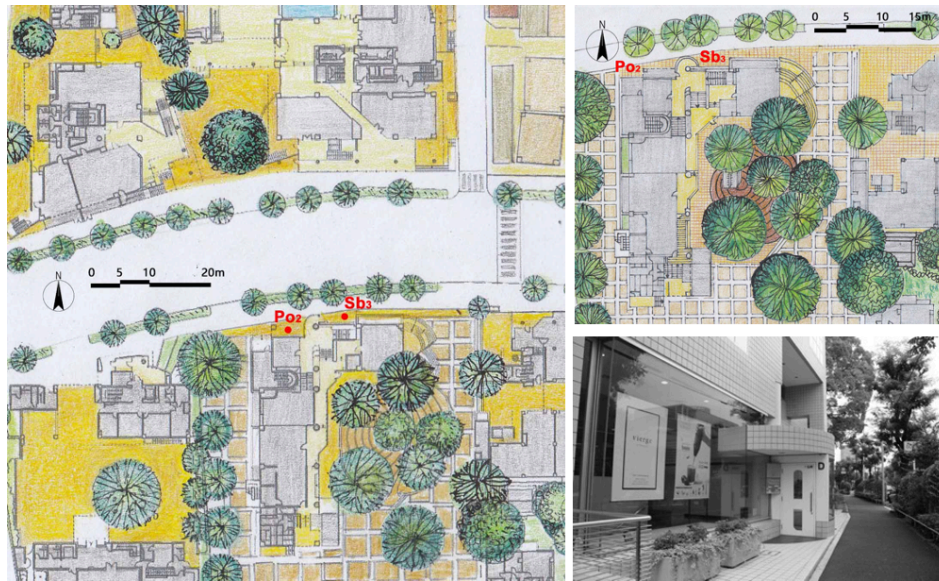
The porch (Po) and setback open space (Sb) in Building D. (Source from: drawing and photo from the author)
